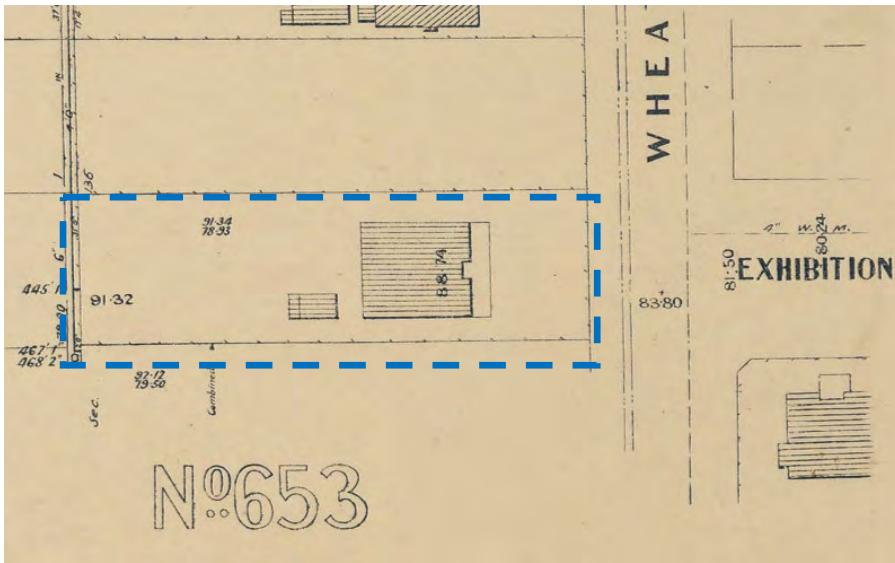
Footprint of the house and its outbuildings, 1926 (Source: MMBW DP 2845, dated 1926).
